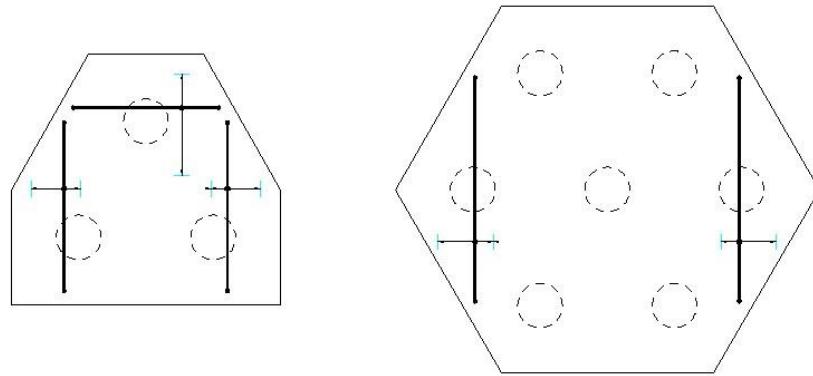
2 Three and Seven Pile, Secondary Reinforcement
